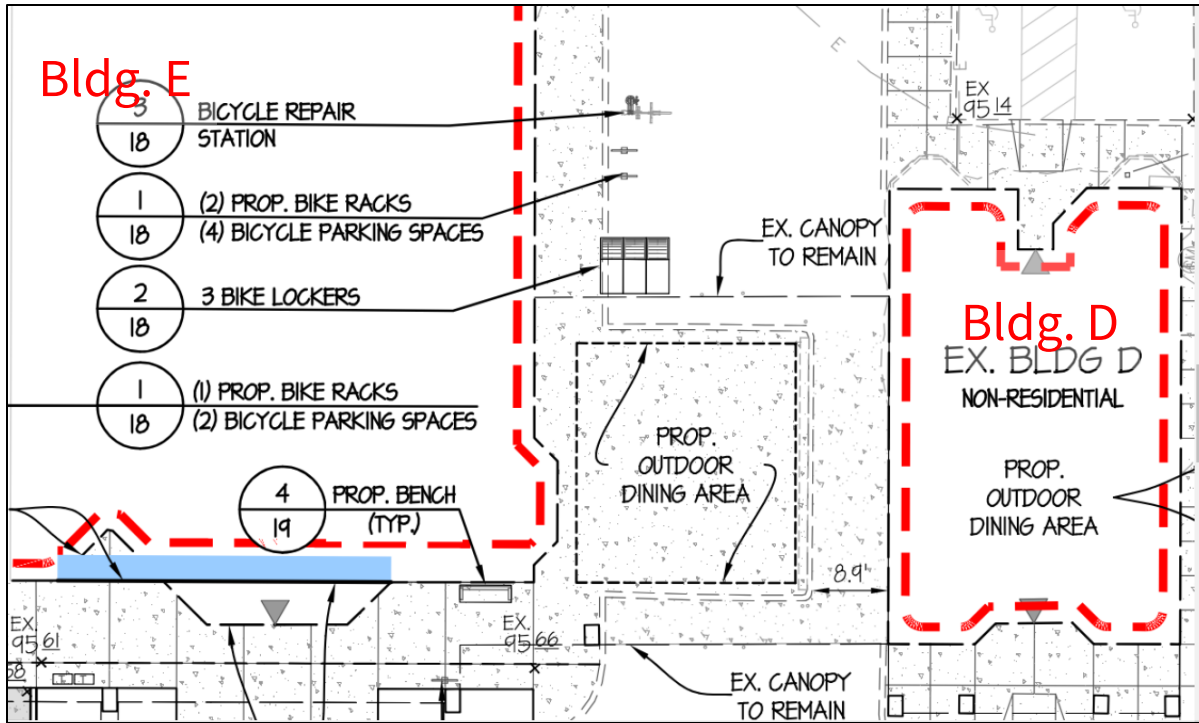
Long-term bicycle parking, repair station, and area of short-term bicycle parking
